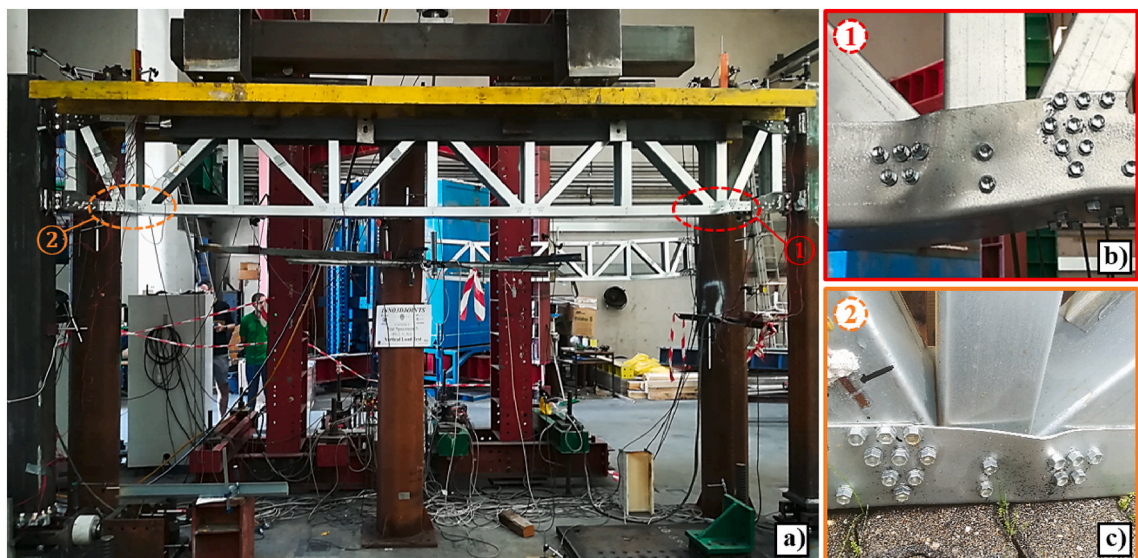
Failure mode and post-test deformed configuration - FC2-V.
